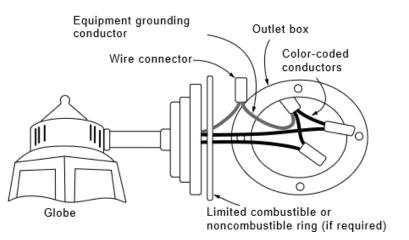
Typical Installation of Surface-Mounted Exterior Lighting Fixture.
